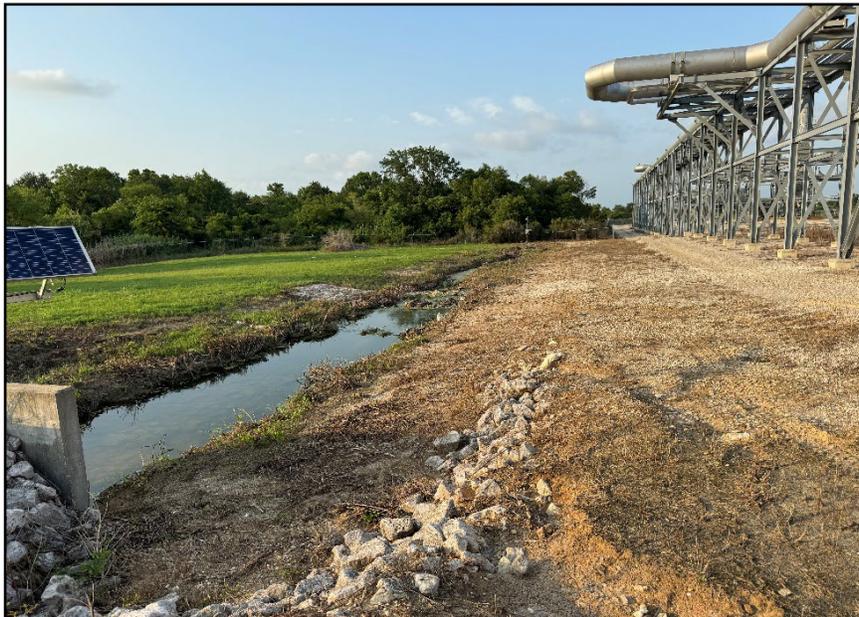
View of Drainage Ditch Upstream of Outfall 002
